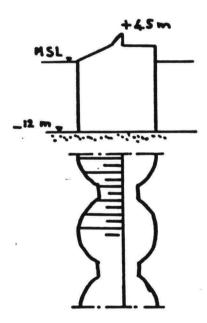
Hanstholm breakwater with sloping front 1:3
